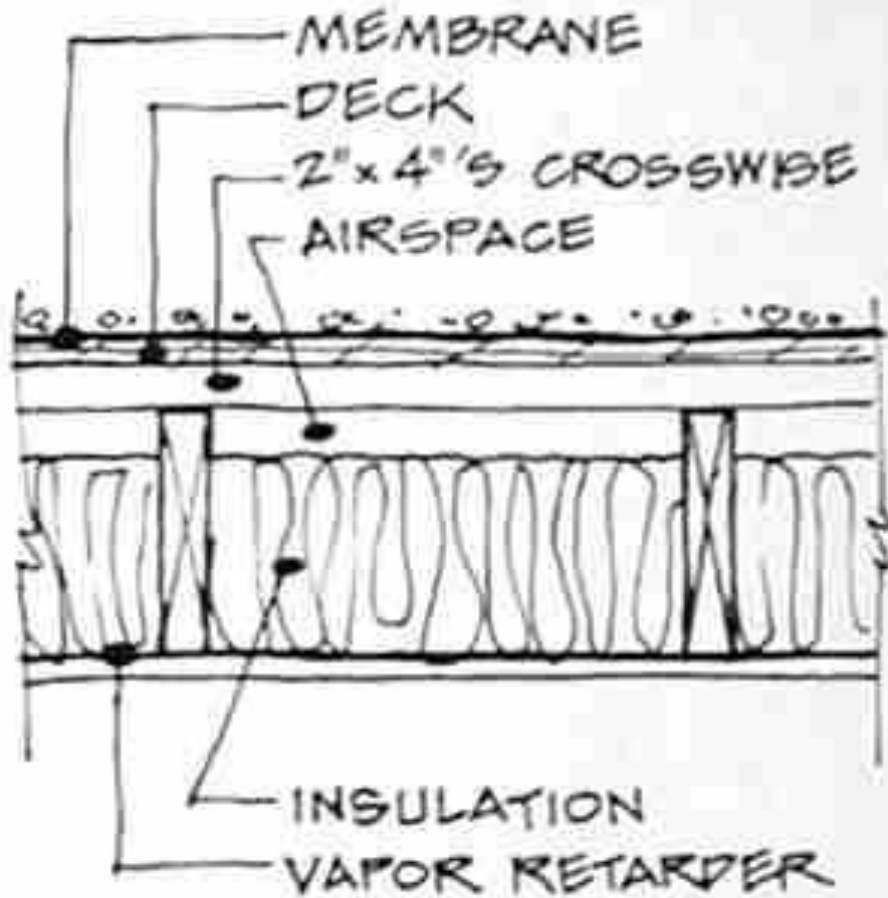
Flat woodframe roofs need a good air/vapor barrier and good ventilation. A ventilation plenum can be formed by laying 2x4's across the joists.
